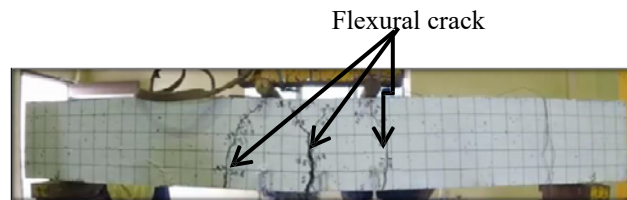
Bending failure of beam B1 at load 27.42kN.
